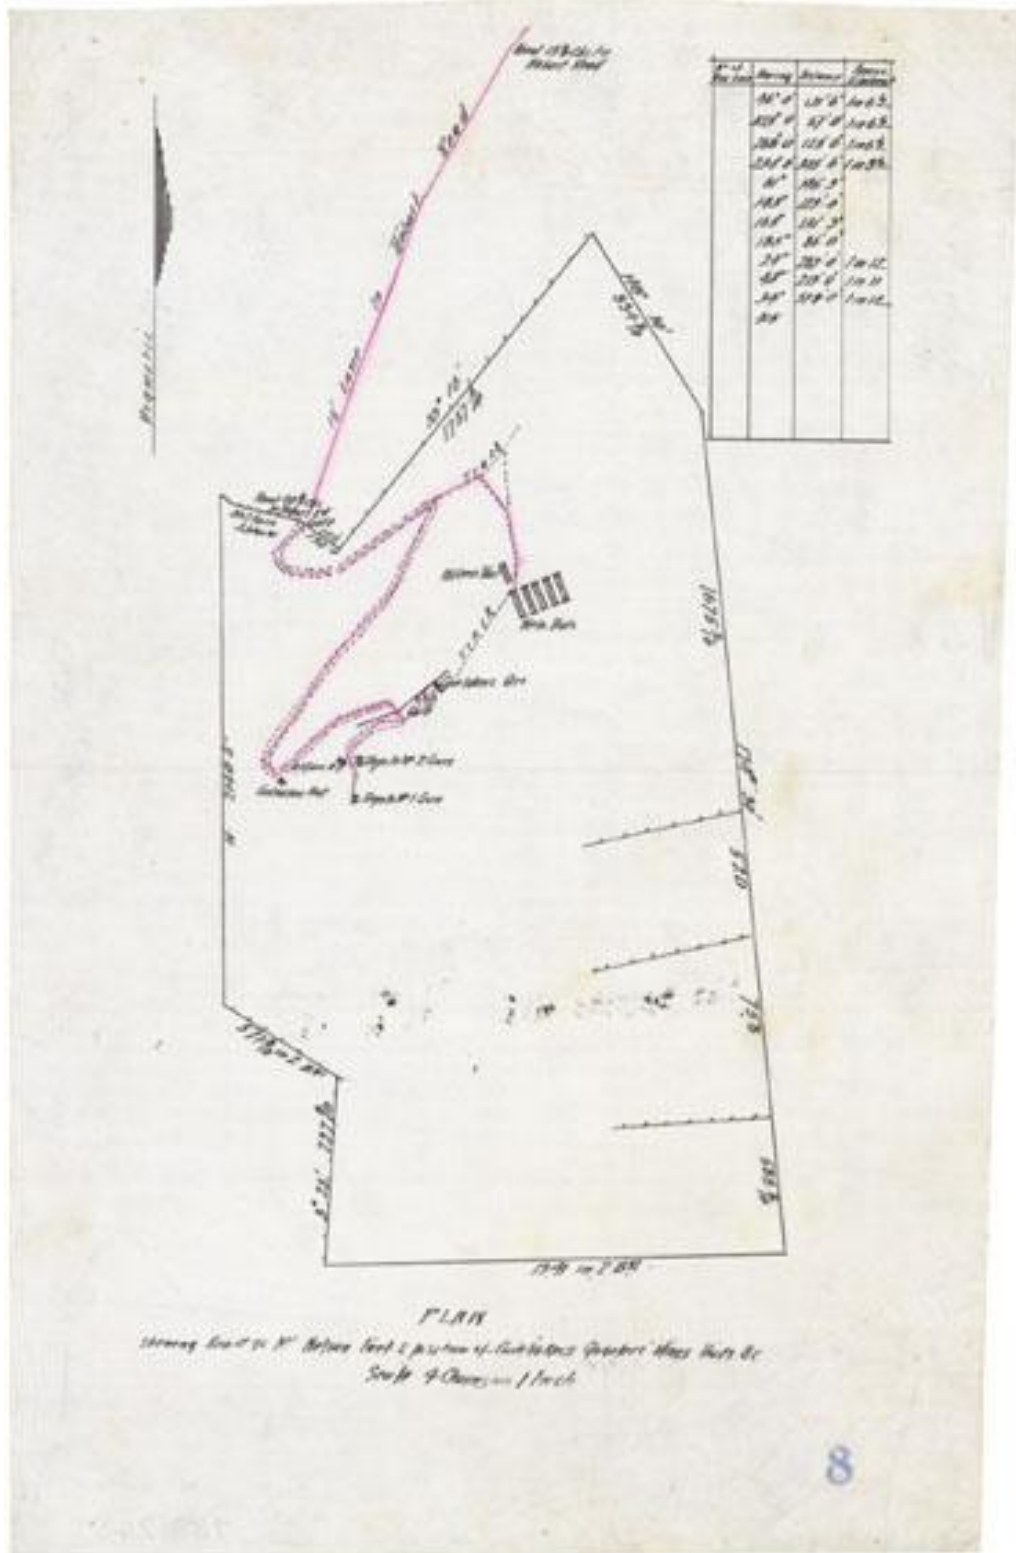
(1912) Site plan - showing road to Mount Nelson Fort and position of Caretaker's Quarters (National Archives of Australia, 8).
